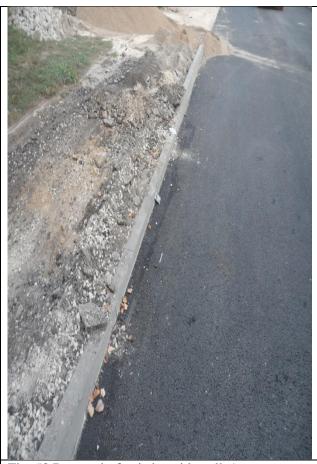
Renewal of existing sidewalk /. Подновяване на съществуващ тротоар
